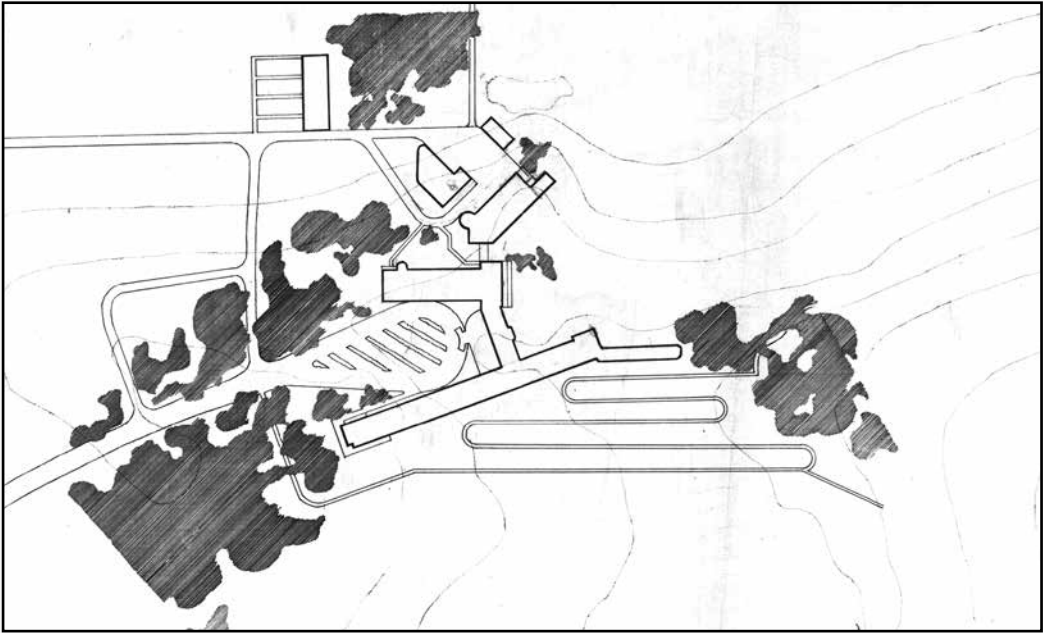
Master drawing of the site plan, April 1930. The building was approached from southwest along a road. The yard between the main wings had a car park and plantations. On the southside of the A wing was a geometric garden as a contrast to the surrounding pine forest. This site plan, which was the one presented to the State Medical Board, did not include the Medical Director's residence, or the terraced house for Junior Physicians and the Administrative Director. Detail of drawing No. 50-74. AAM.
